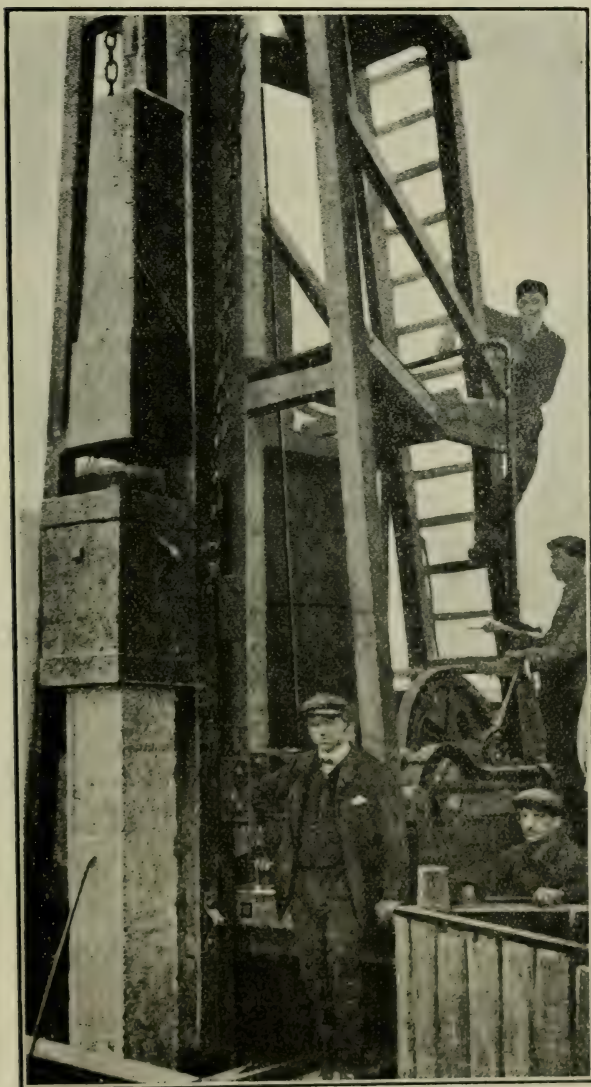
Driving reinforced concrete piles, 45 ft. long, 14 in. square, for N.E.R. Co.
